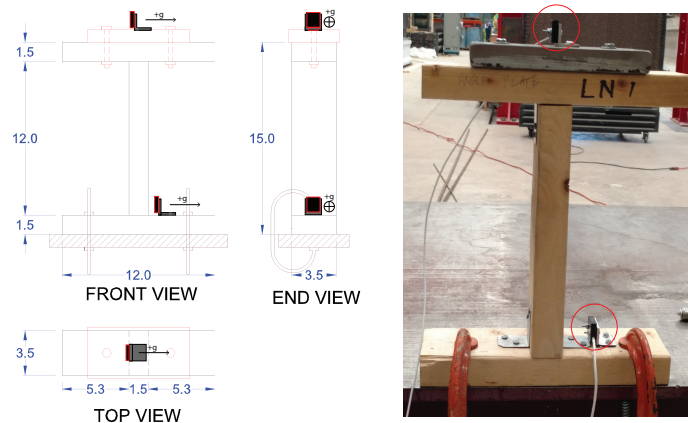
Test configuration for a typical T-shaped timber joint specimen; all dimensions are in inches
